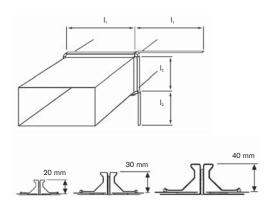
The larger the duct, the larger the flanges required. Extra space is also needed so that the cleats can be attached.
